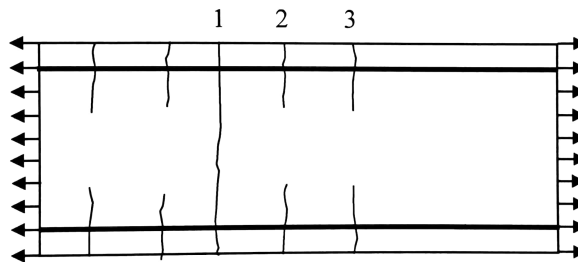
Example of cracking process for thick reinforced concrete member from Engström (2011).
